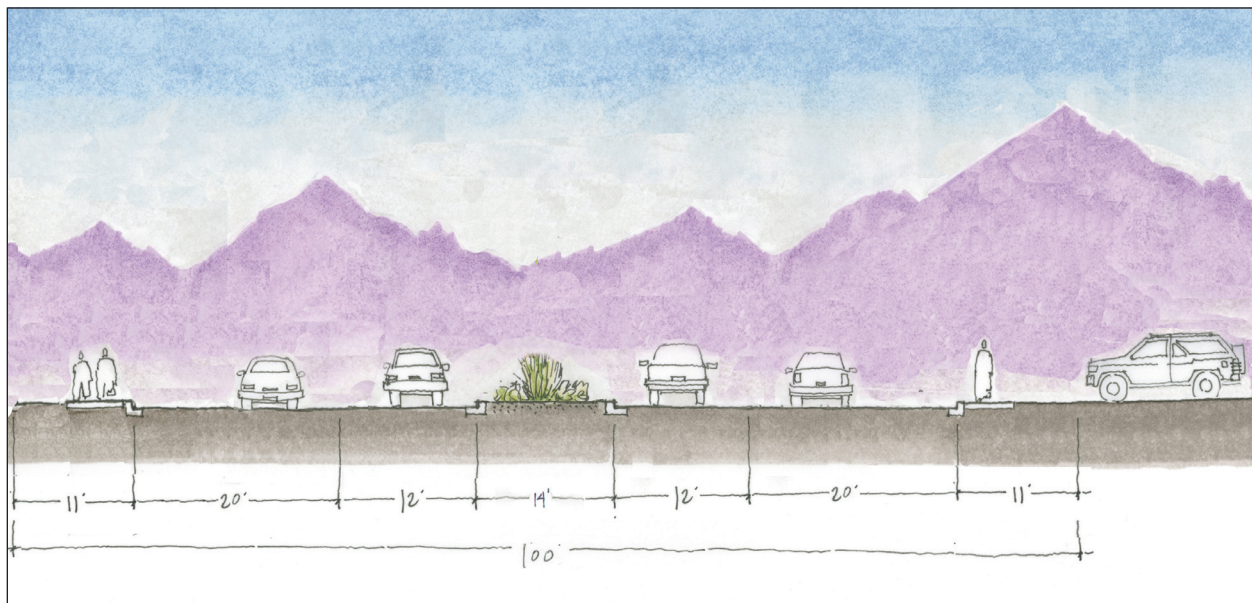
Harrison Street from Avenue 50 to Westerfield Way/1st Street looking north – Existing
